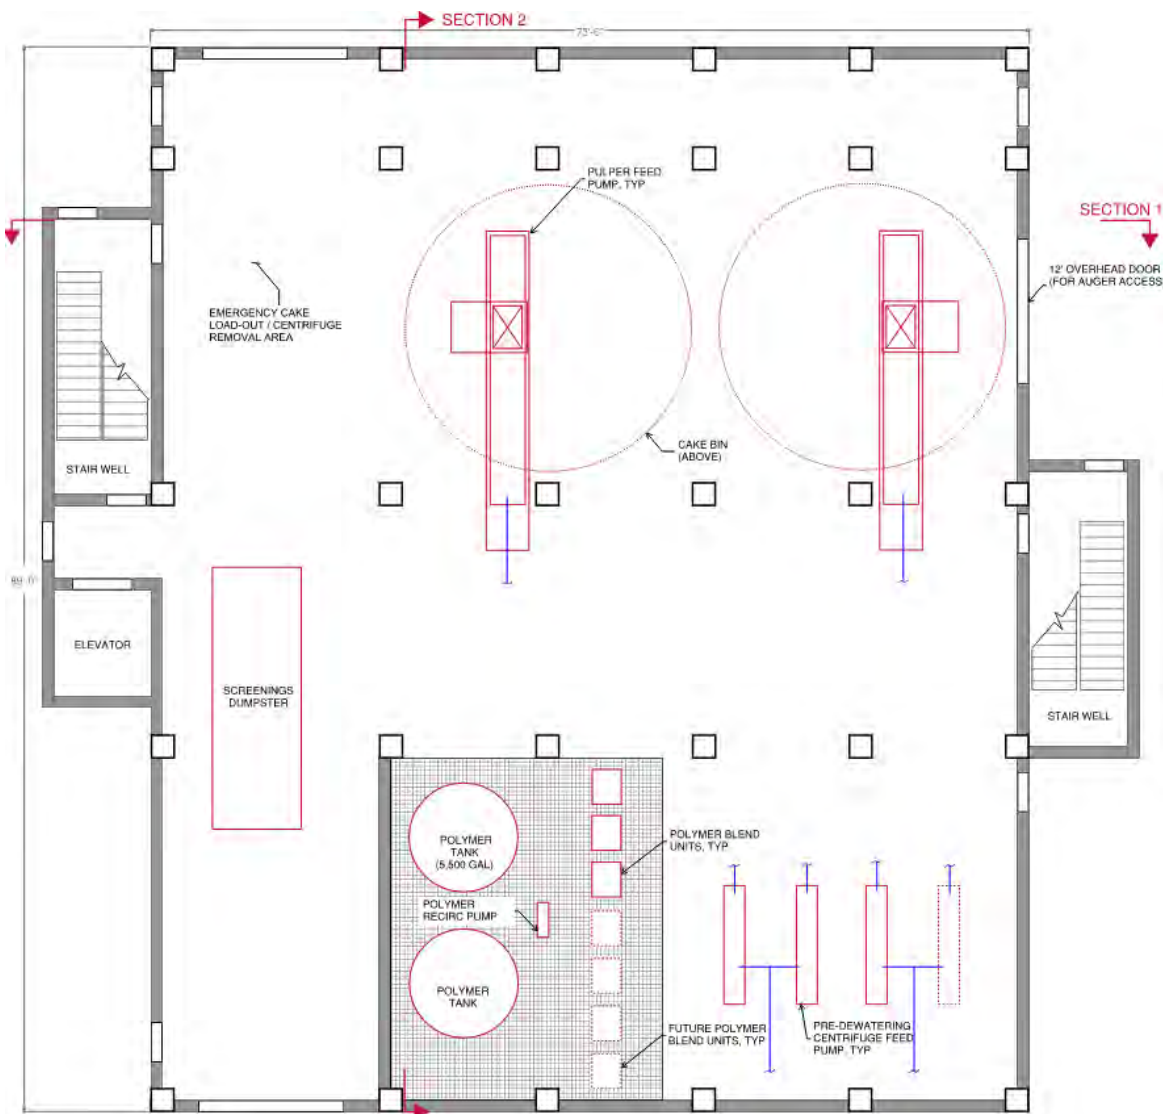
New Thickening/Screening/Dewatering Facility First-Floor Plan
